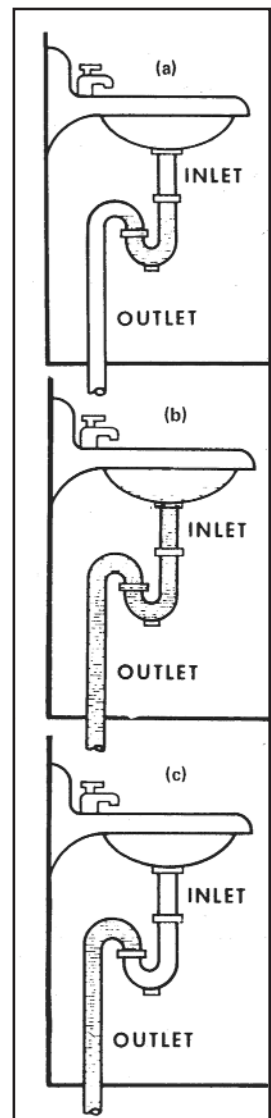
Trap Seal: [a] Seal Intact; [b] Fixture Draining; [c] Loss of Gas Seal [1]
